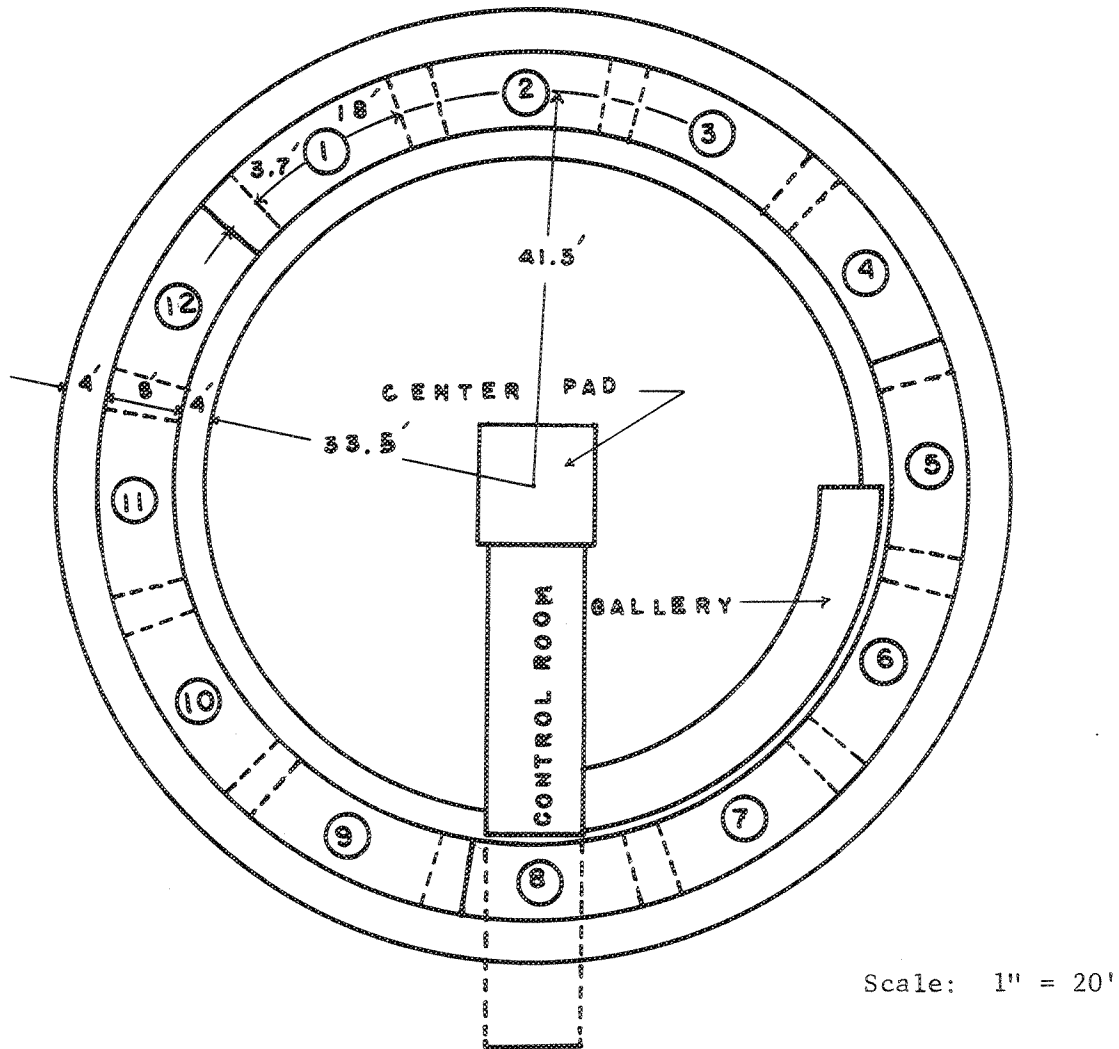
PERMANENT STRUCTURES AND PAVEMENT SECTIONS
